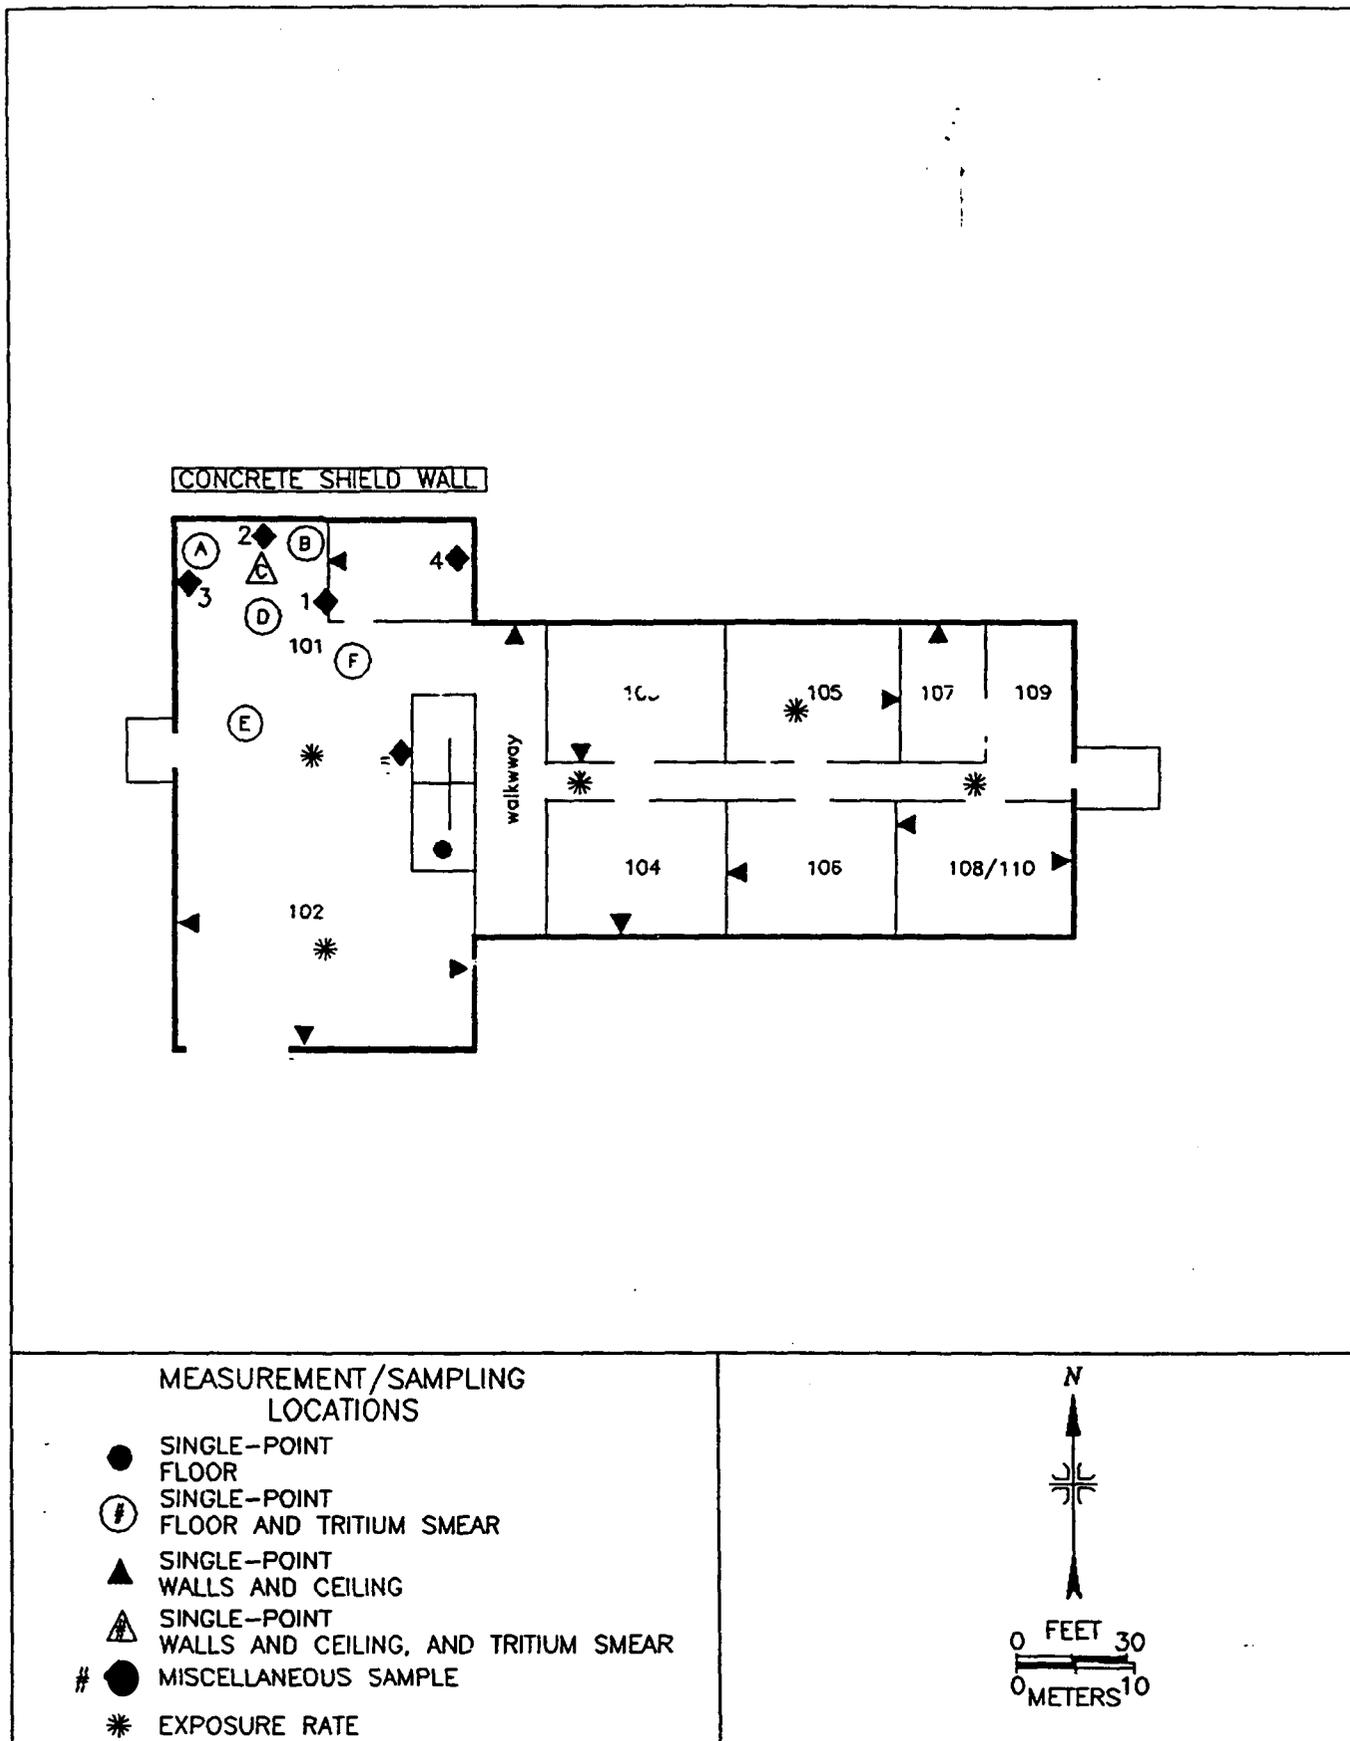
Building T030 – Floor Plan and Measurement and Sampling Locations
